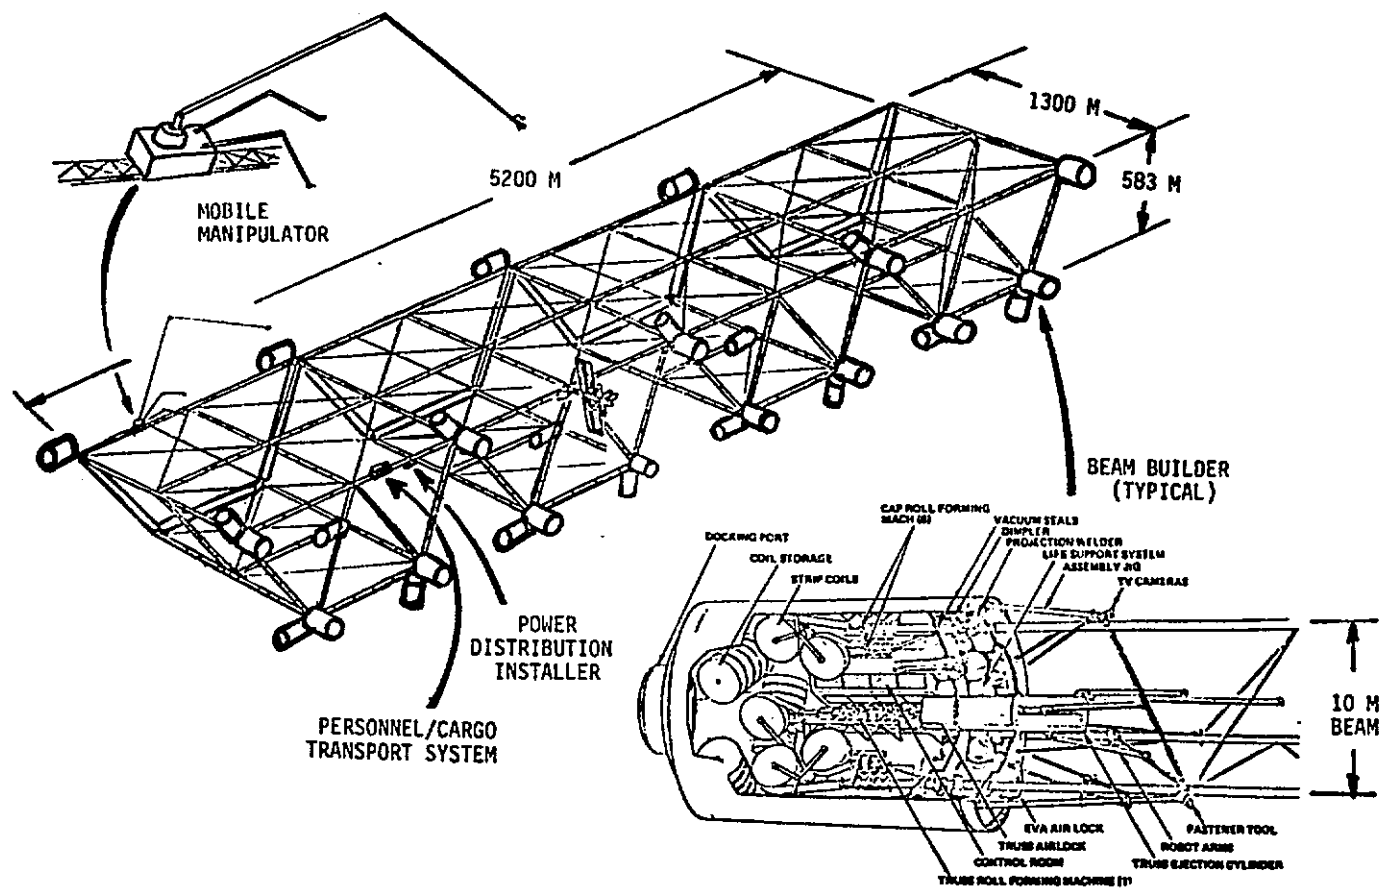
Truss Type SPS - Construction Facility Concept
